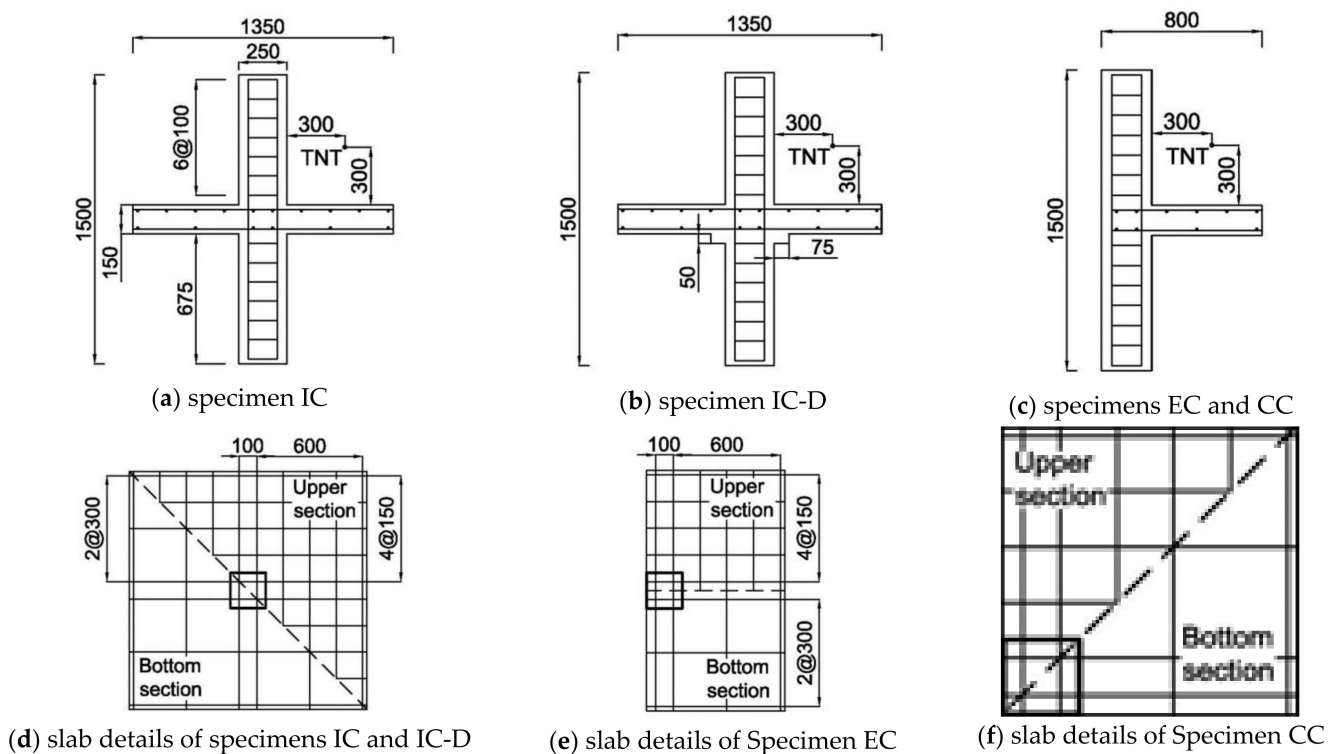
Details of specimens: (a) specimen IC; (b) specimen IC-D; (c) specimens EC and CC; (d) slab details of specimens IC and IC-D; (e) slab details of specimen EC; (f) slab details of specimen CC.
